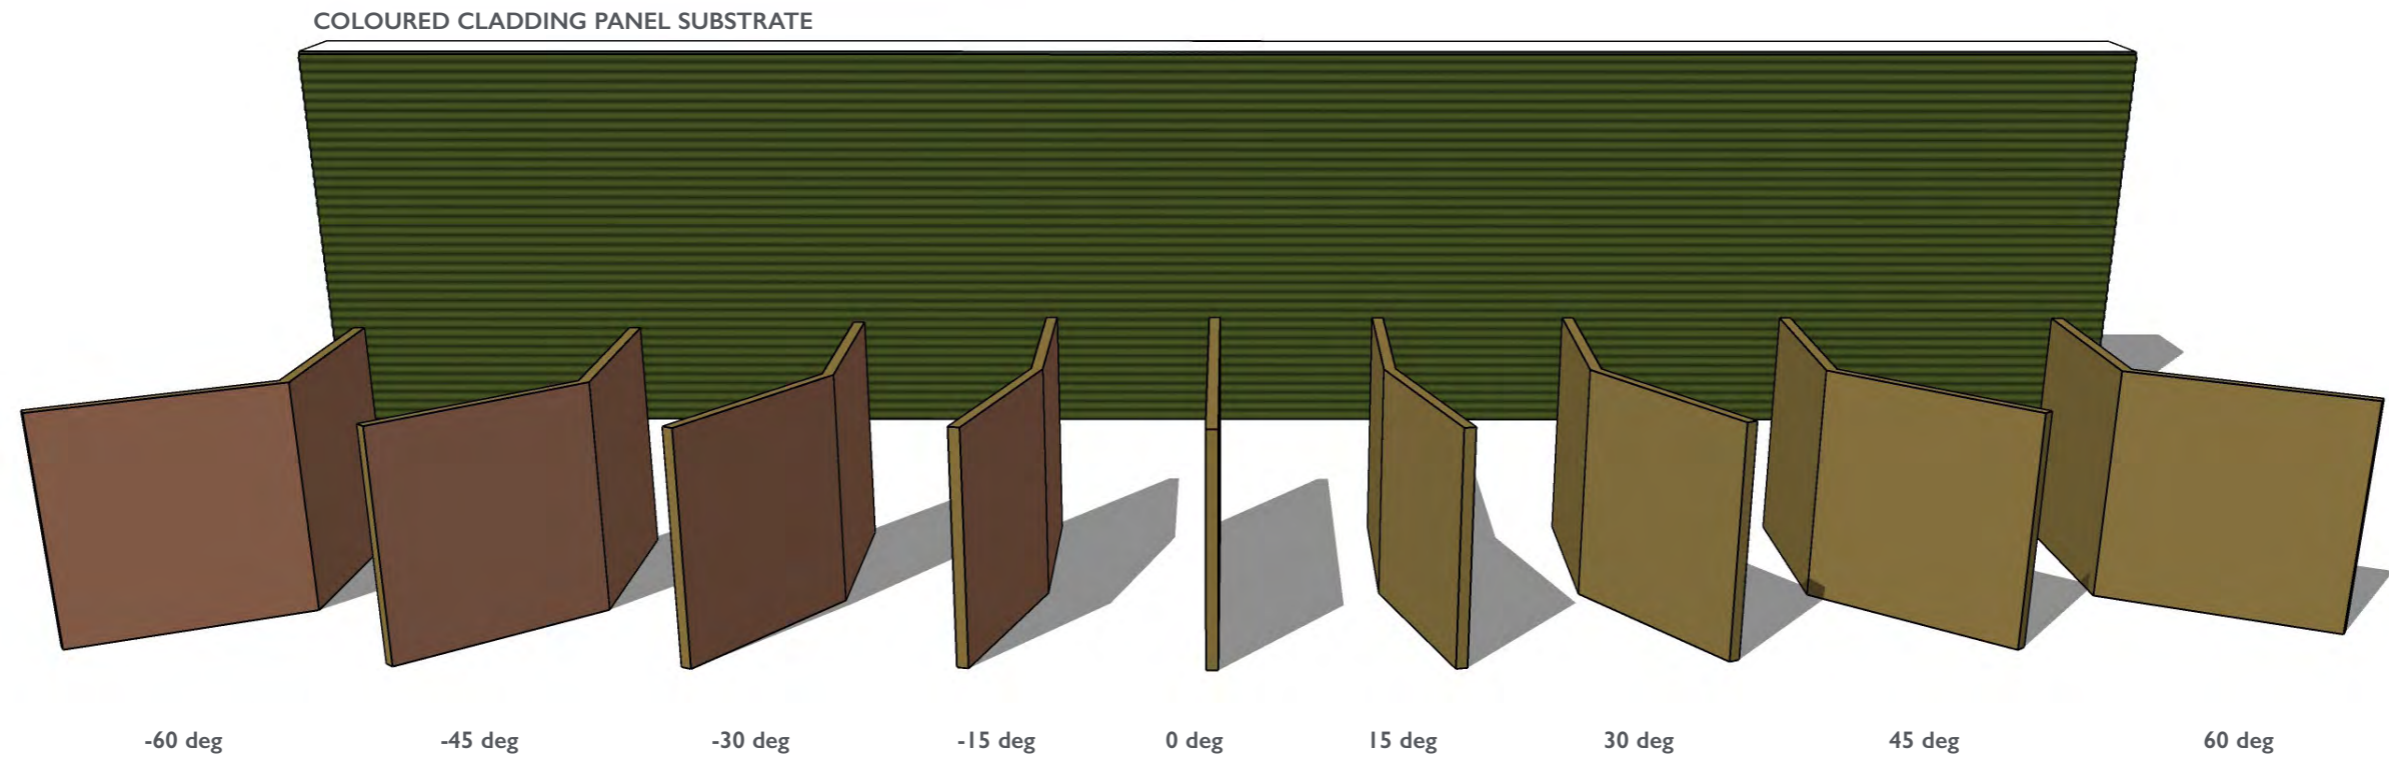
DETAIL SHOWING MOUNTING RAILS AND BENT BLADES
